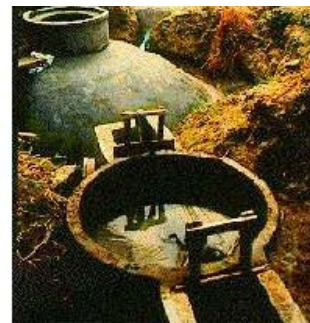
Installation of a fixed-dome plant in Thailand: The influent collecting tank is in front of the photo, the digester and the outlet are located behind it.
